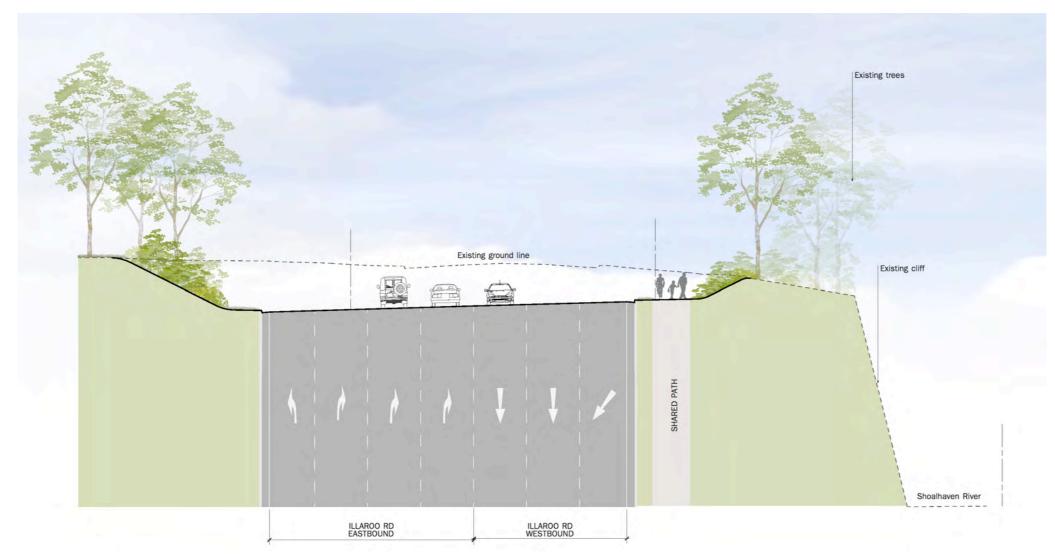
Section 3 through Illaroo Road - Chainage 100 (Scale 1:250)
